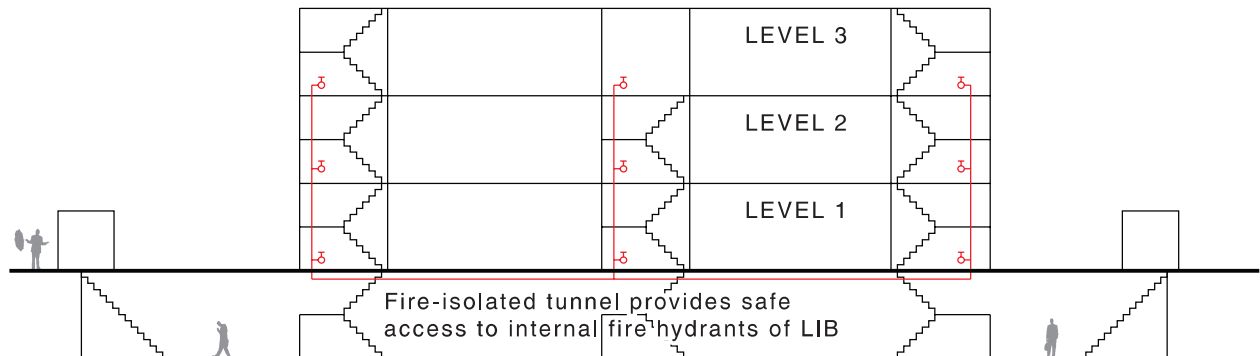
Internal fire-isolated stair and tunnel service interior of an LIB
